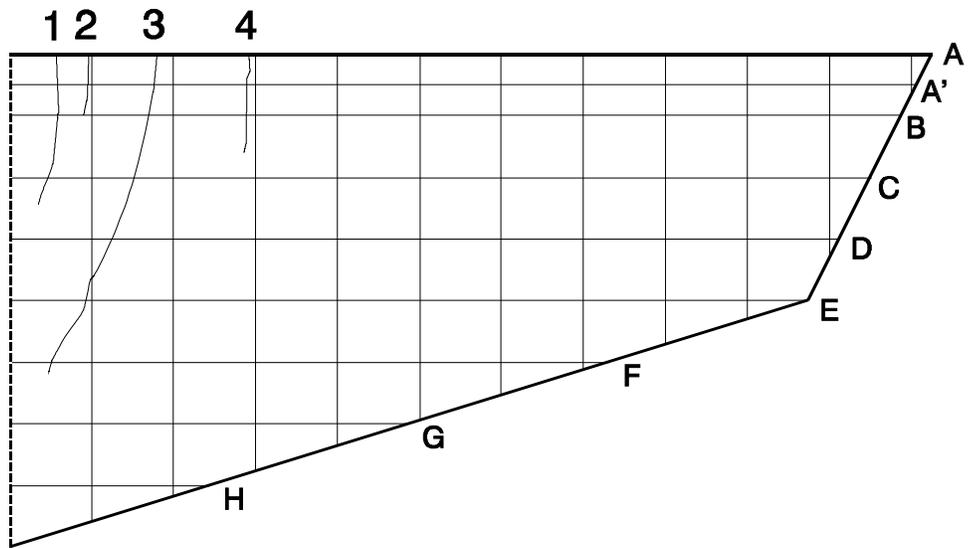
POJ-PU-54-TH cracking pattern on north face of overhang at service load
